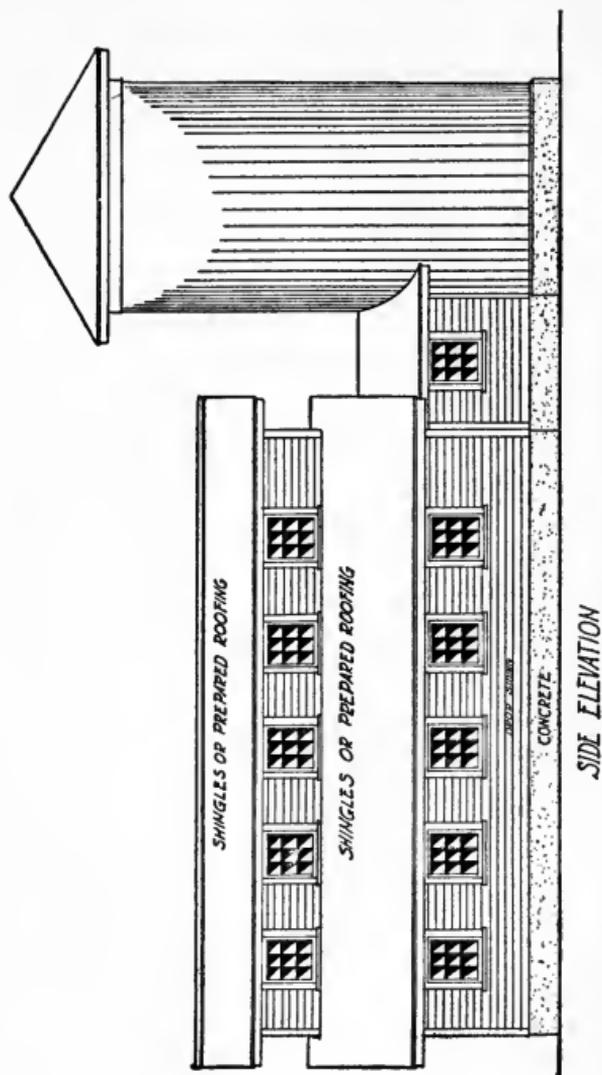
Side Elevation Showing a Monitor Roof Dairy Stable with Large Silo
